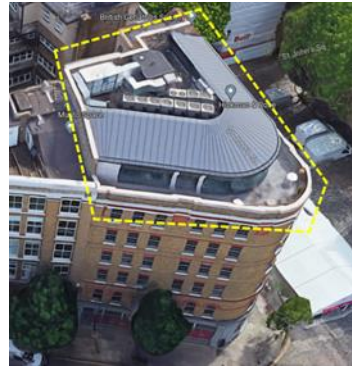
Approved roof extension at No's 33-35 St John Square (ref. P2018/1671/FUL).
